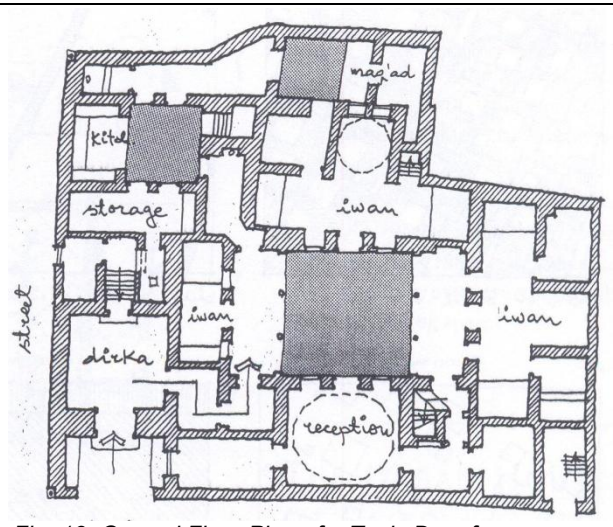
Ground Floor Plan of a Tunis Dar sfar
